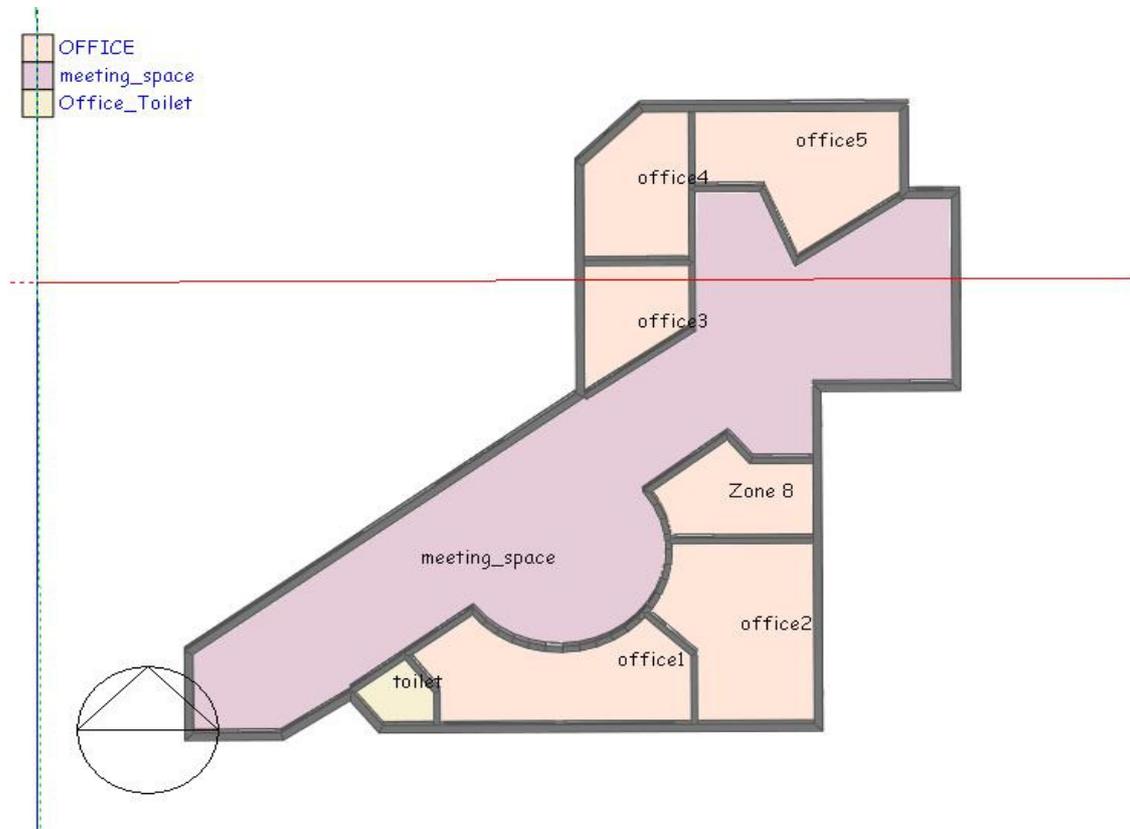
Plan of the first floor as designed in DesignBuilder.
